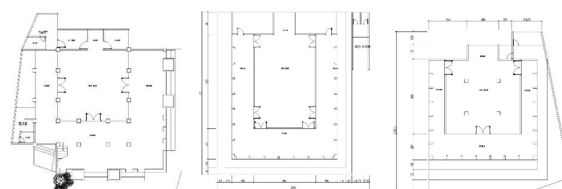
Some examples of the mosques' floorplan with the simple connection between main rooms and the main hallway
